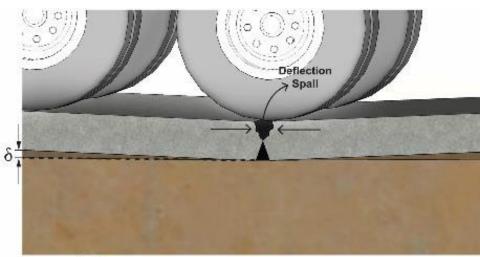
Deflection spalling mechanism without dowel bars
